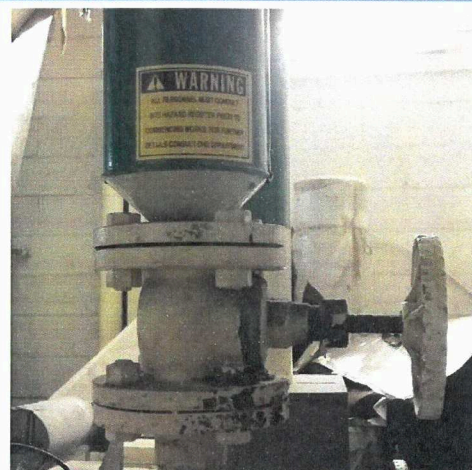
Level 23, Plant Room, Piping adjacent to Diesel Generator - Gasket
